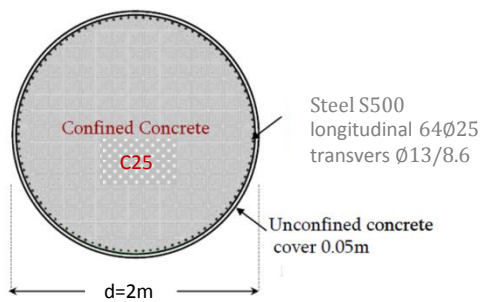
Geometric characteristics and reinforcement of pier's section
